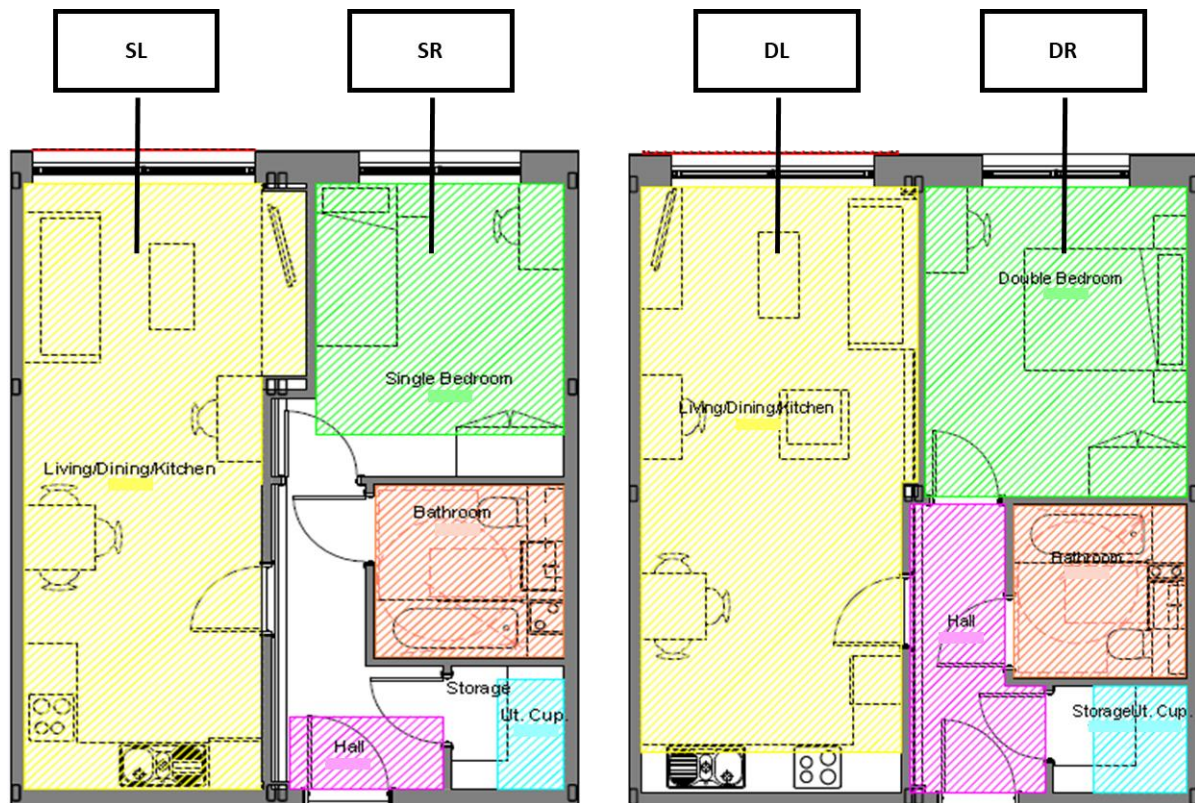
Single bedroom apartment floor plan on left and double bedroom on right (SL = Single bedroom left; SR = Single bedroom right; DL = Double bedroom left; DR = Double bedroom right).
